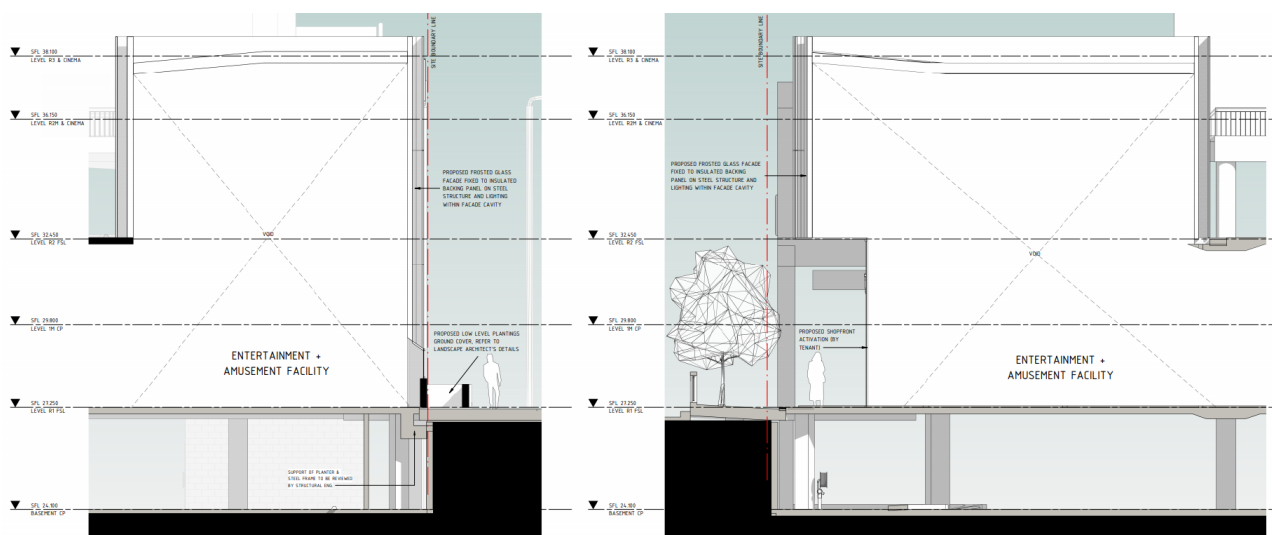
illustrates the proposed corner façade. Figure 5 demonstrates the proposed sections. Refer to the Architectural Plans located at Appendix B and Landscape Plans located at Appendix B for more information.
